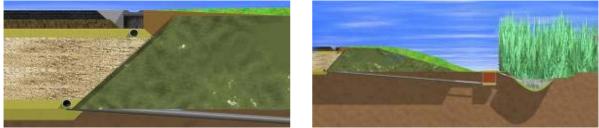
Illustration of the road construction, drainage system and ecological zone
